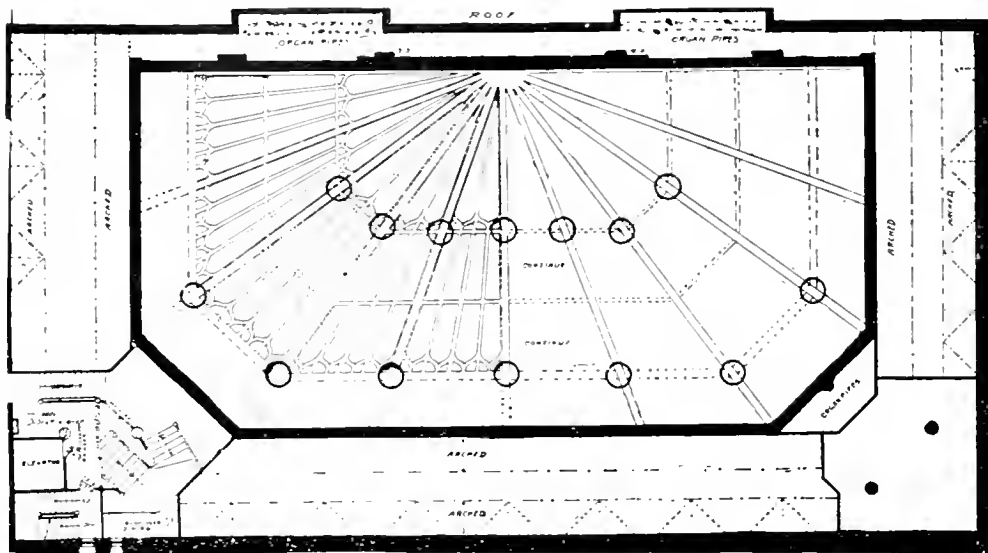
Floor Plan of the Church Shown in Fig. 9. Location of Lighting Units Marked by Circles
